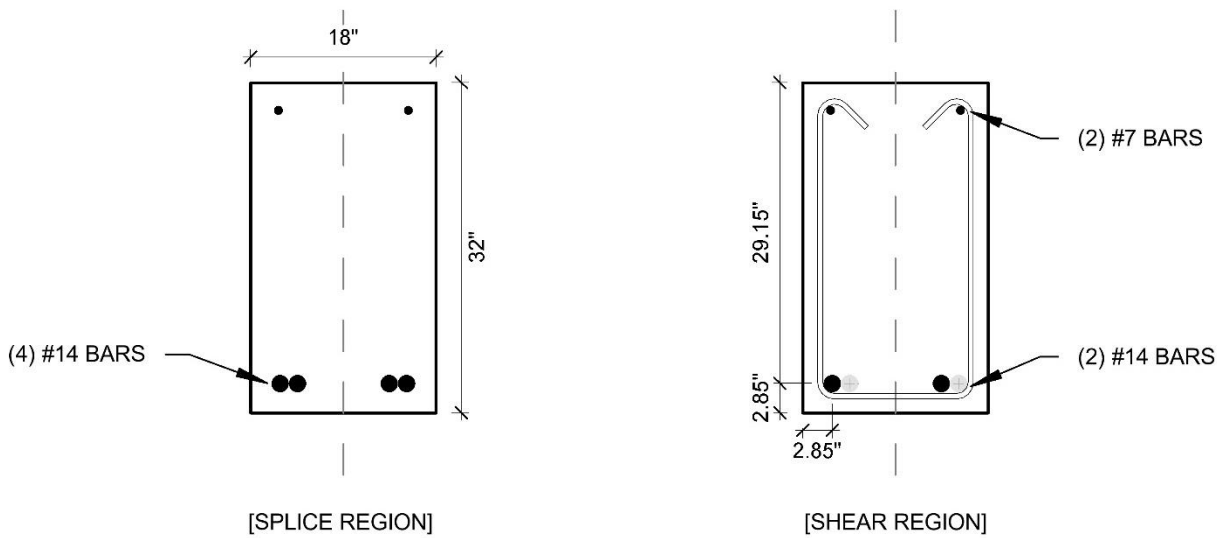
Cross section of 14-f (1 in. = 25.4 mm)
